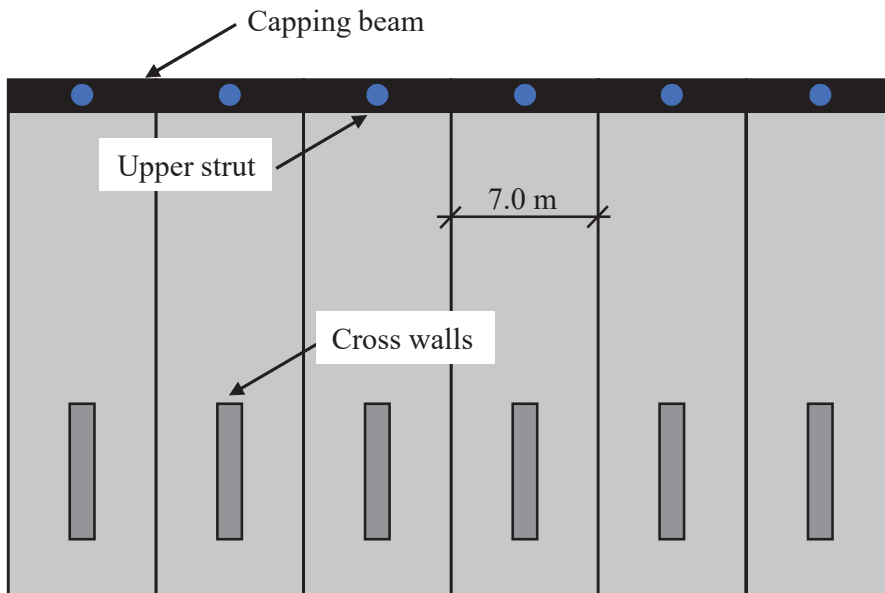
Longitudinal section of the D-Wall panels showing the cross wall panels and the upper strut layer.
